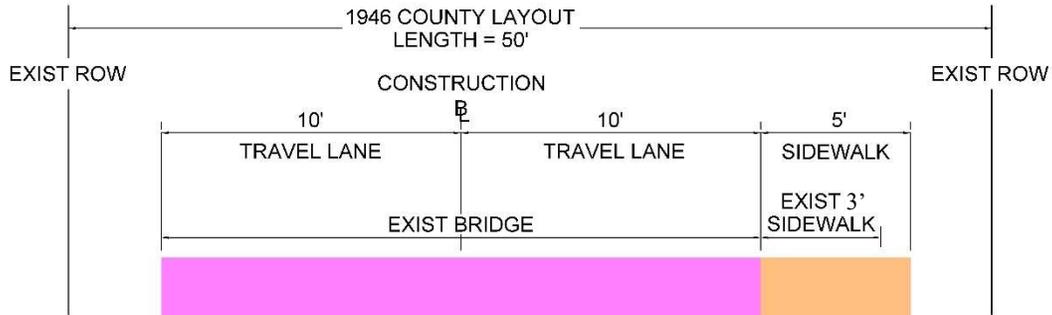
Typical Bridge Section for Ames Avenue Bridge
